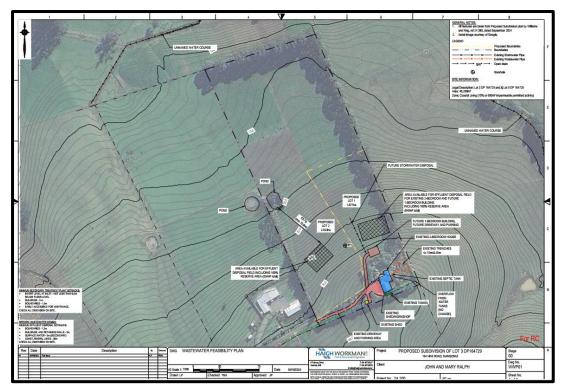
Haigh Workman Wastewater Feasibility Plan.
